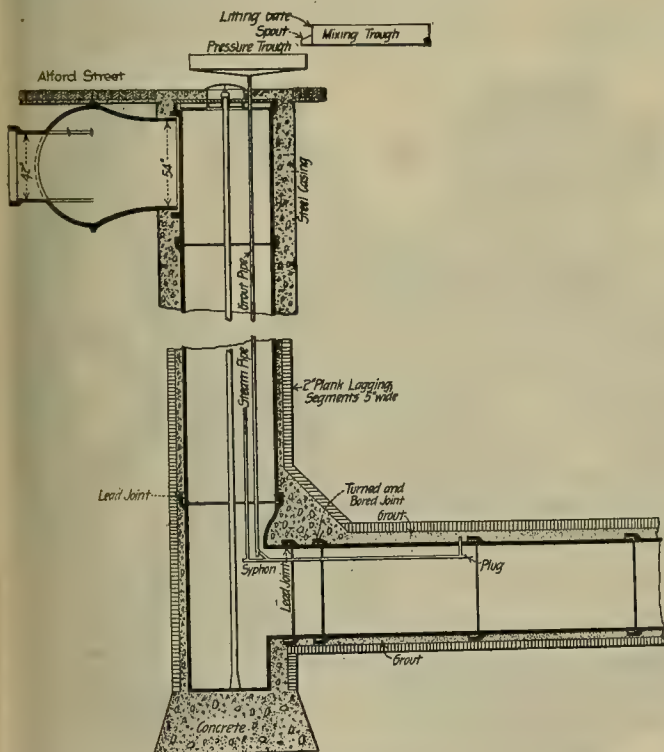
SHAFT AND SHORT SECTION OF CHARLESTOWN SIPHON TUNNEL, SHOWING METHOD OF GROUTING CAST-IRON PIPE IN PLACE.
